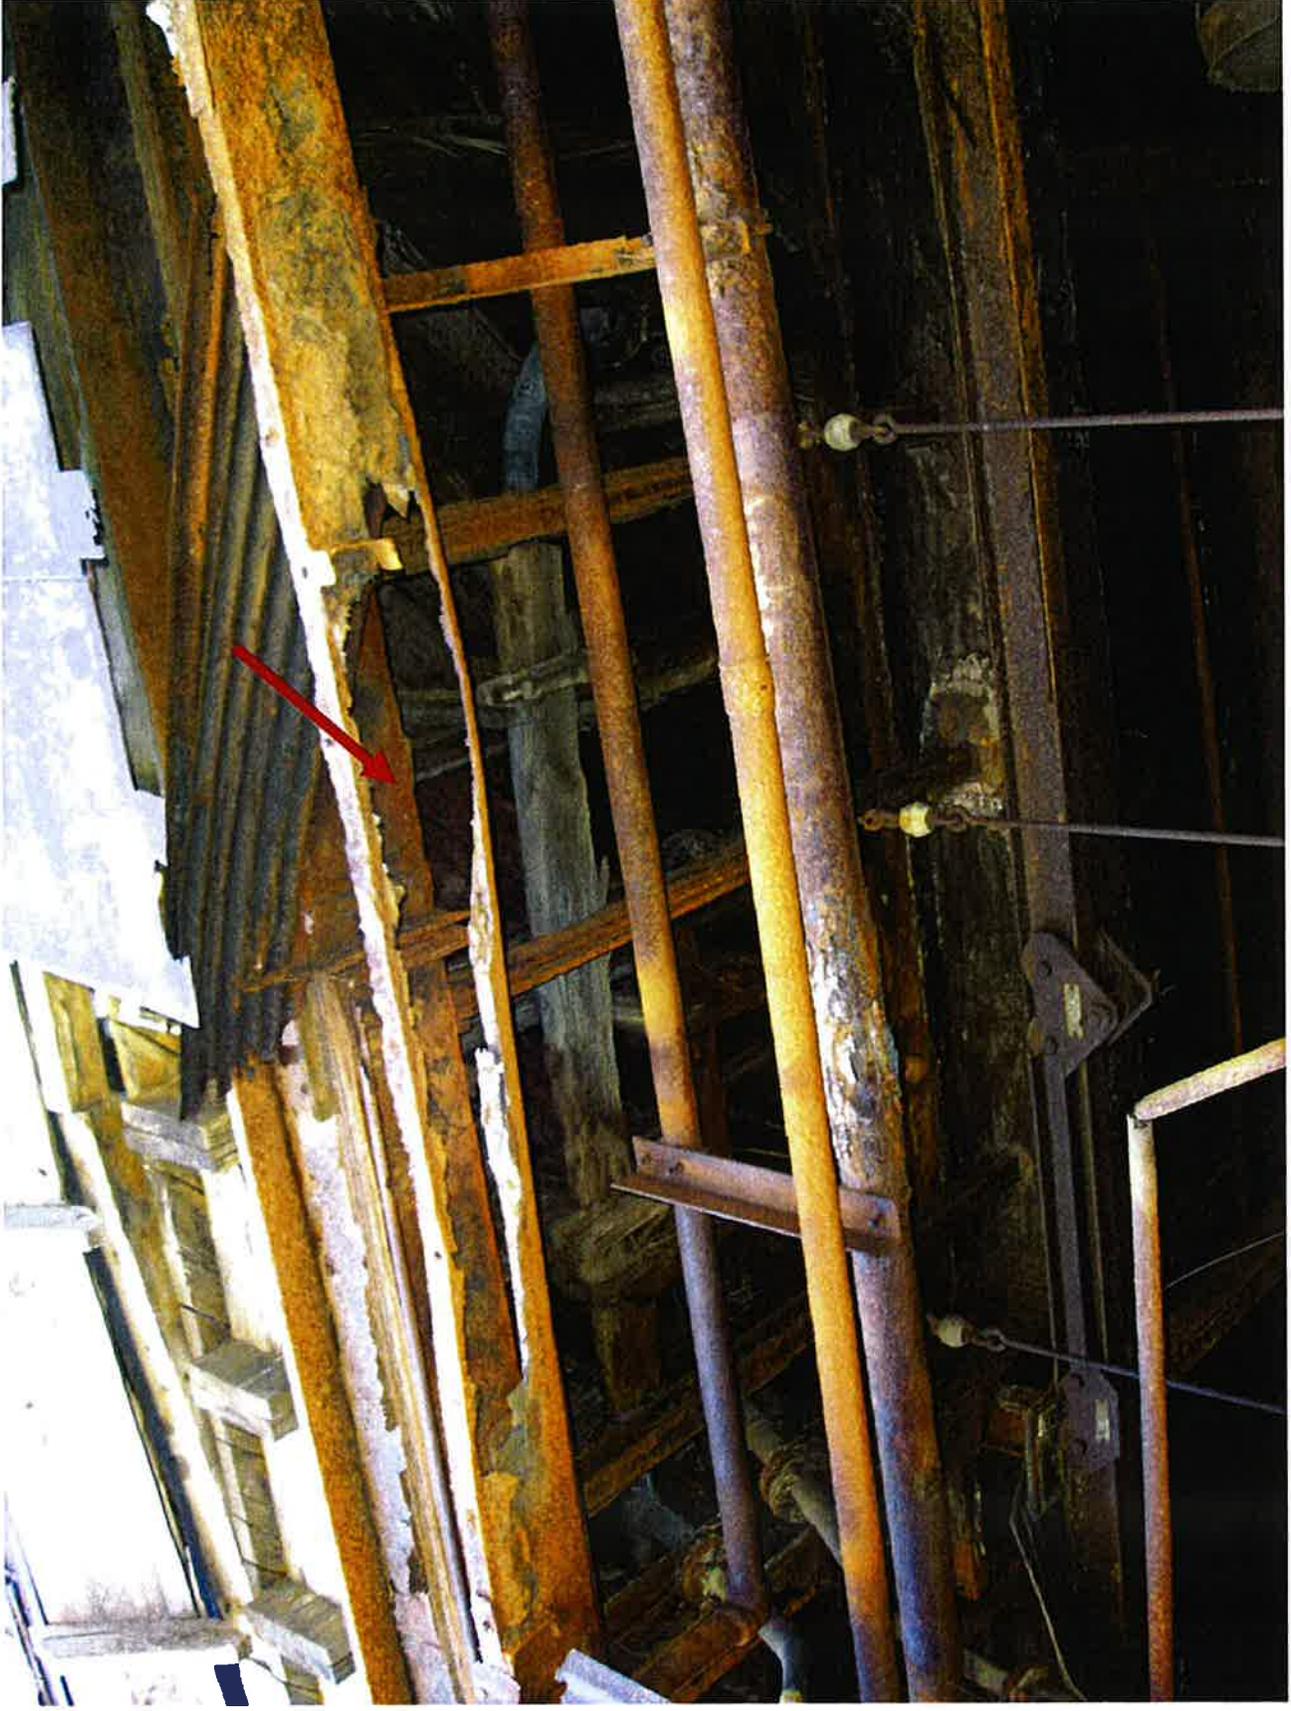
DETERIORATED WALL GIRTS AT NORTH FACE OF BUILDING 2
